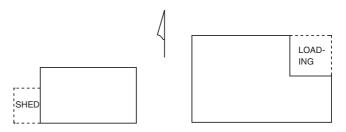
Examples of Open-Walled Structures.
